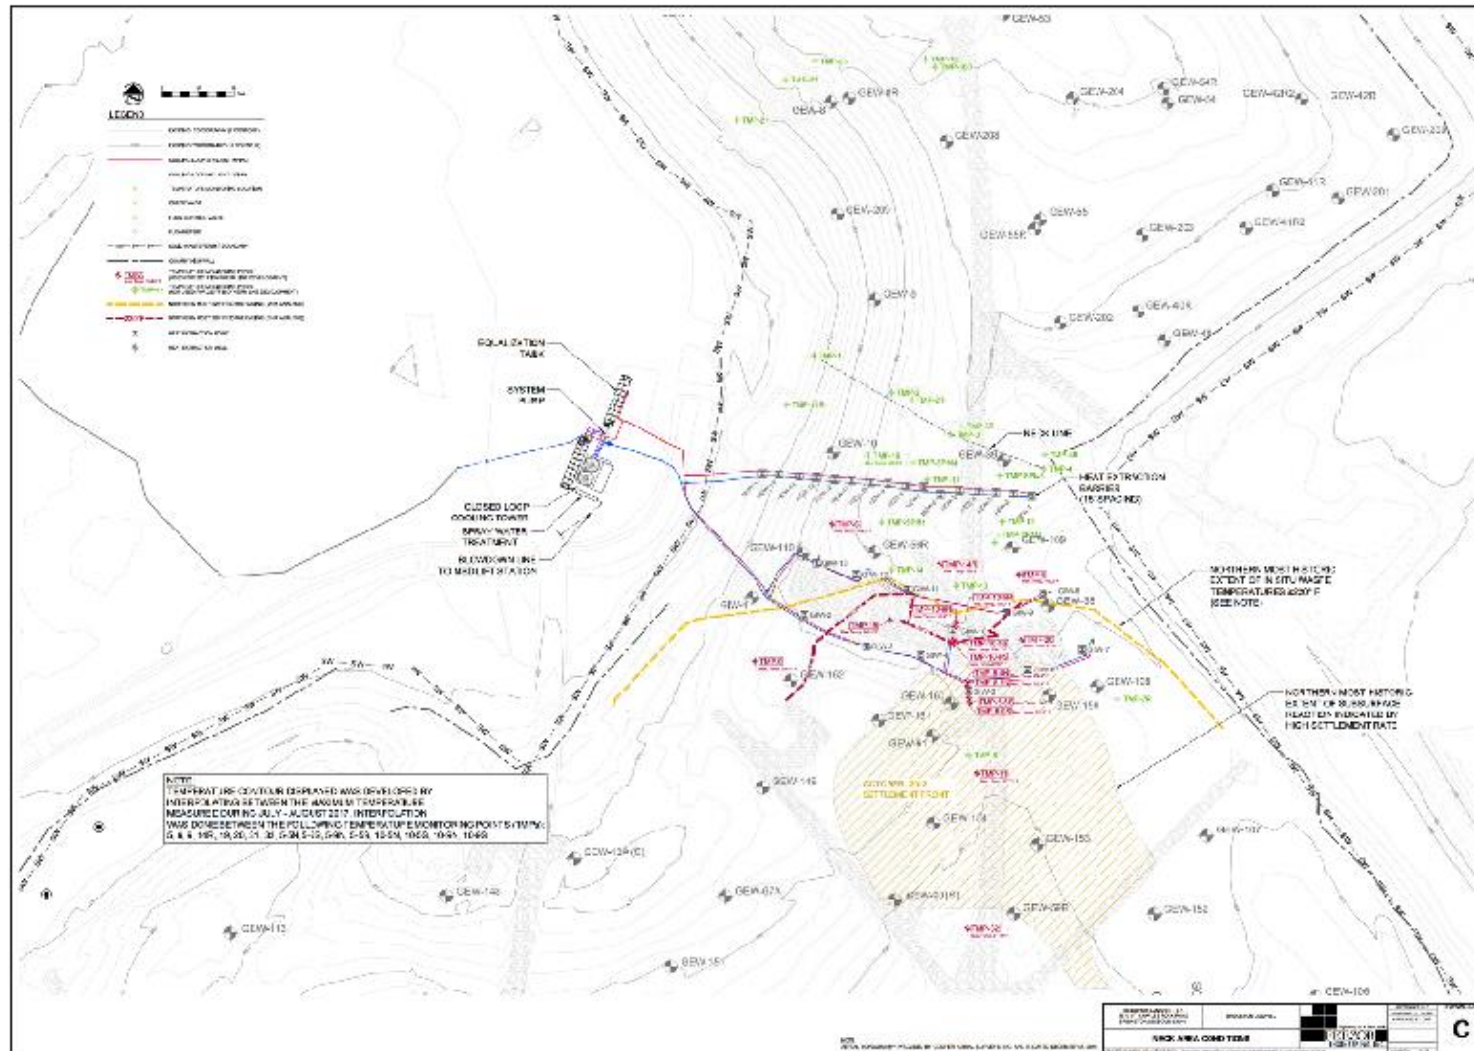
Subsurface Smoldering Event Front at Bridgeton landfill July August 2017 (Ref 4)
